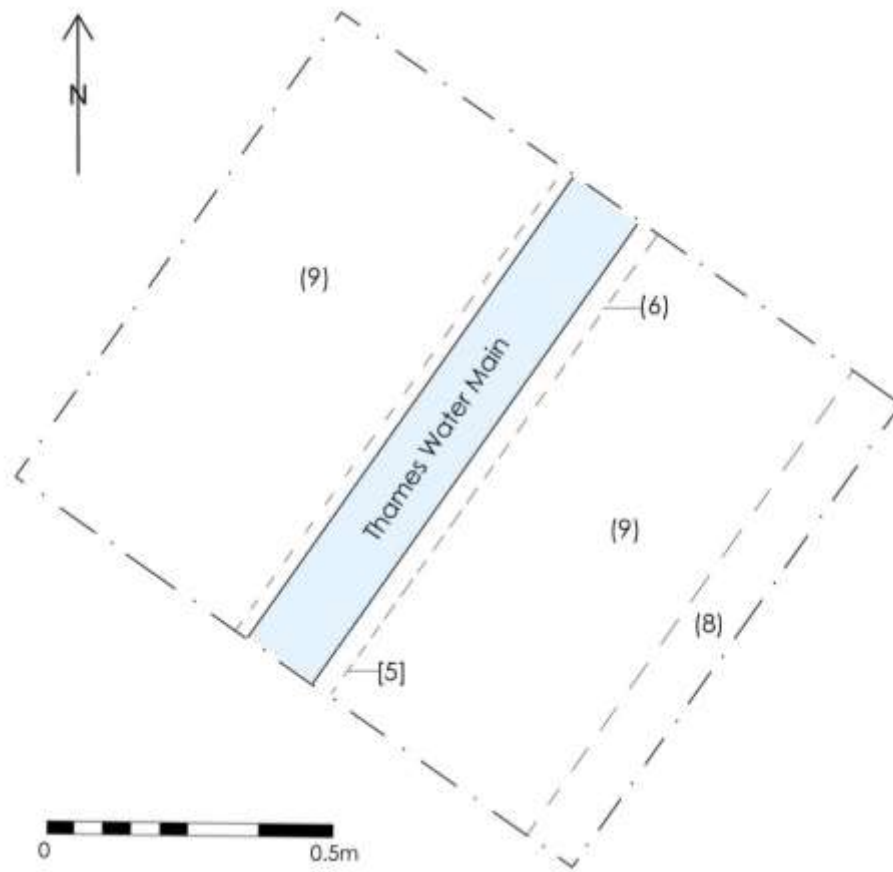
Plan of tree pit 2. Original drawn at 1:20.
